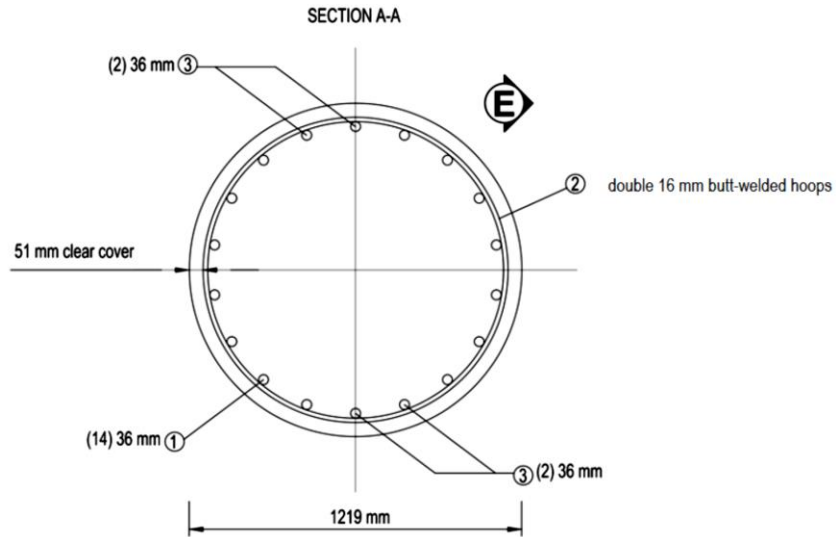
Large Bridge Column (L.B.C.) Test Specimen from Schoettler et al., Column Cross-Section
